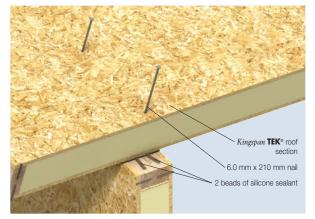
Fixing Roof Section into Gable Wall (Over Hang)
